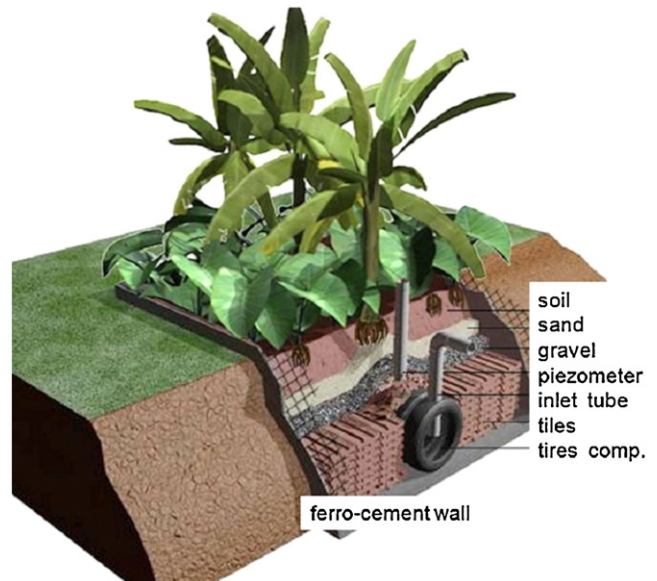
Cross-sectional view of the evaporation tank (TEvap).
